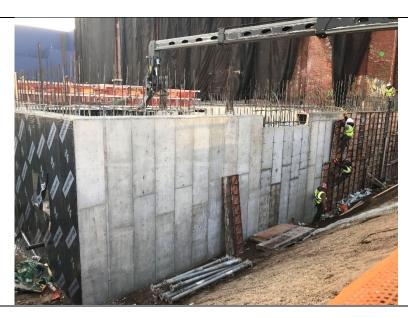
Looking west, Structure Tech pumping concrete into forms along the northern edge of boiler house.
